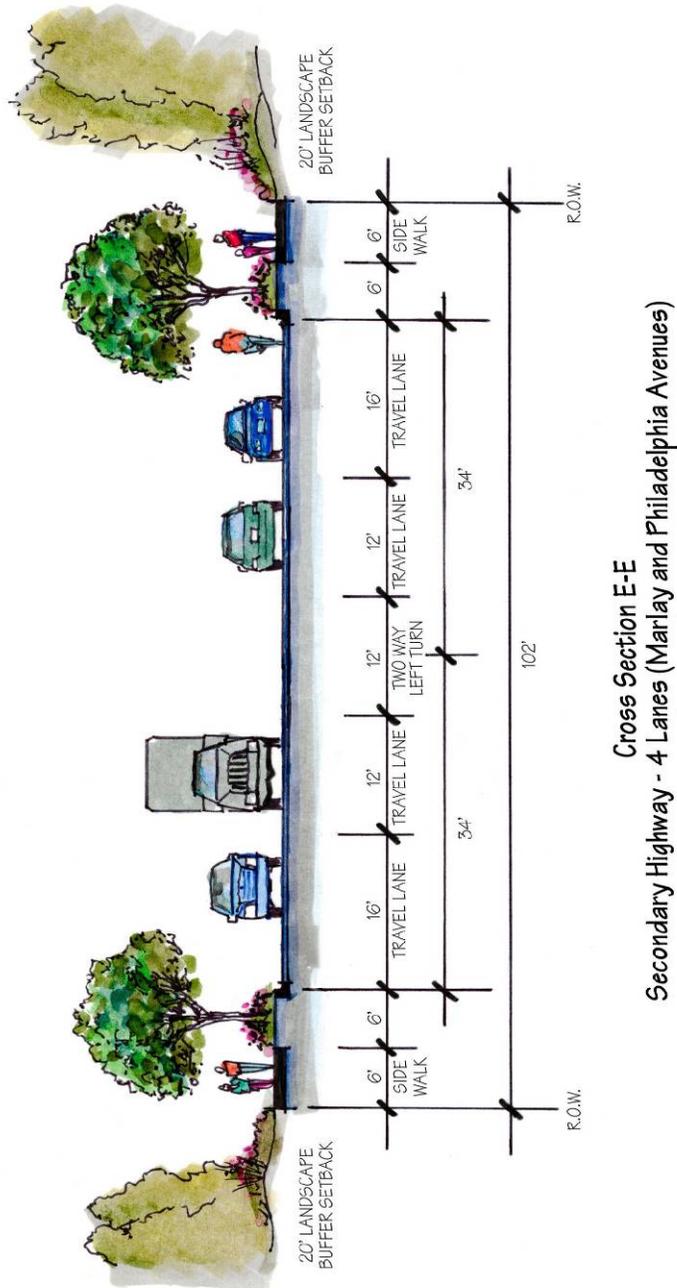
Secondary Highway – 4 Lanes – Cross Section E-E
